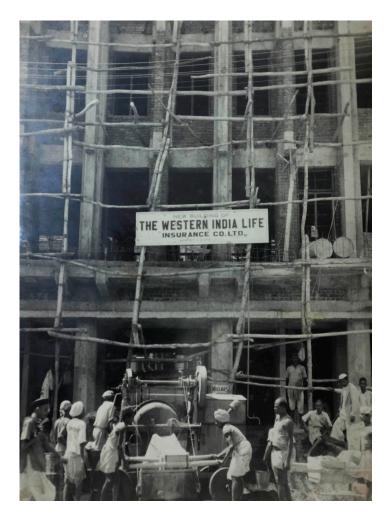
Western India Life Insurance building, Pune. Architect, U.M. Apte. Building under construction, 1952. Photo: Unknown. Source: Private archives of Kiran Apte.
